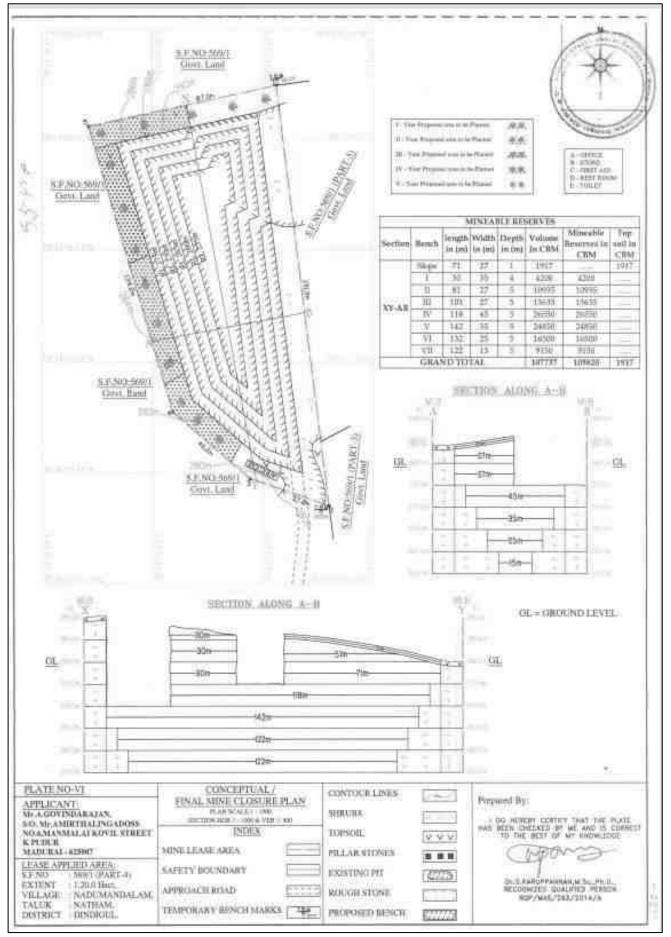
Conceptual Plan, Final mine closure plan and sections
